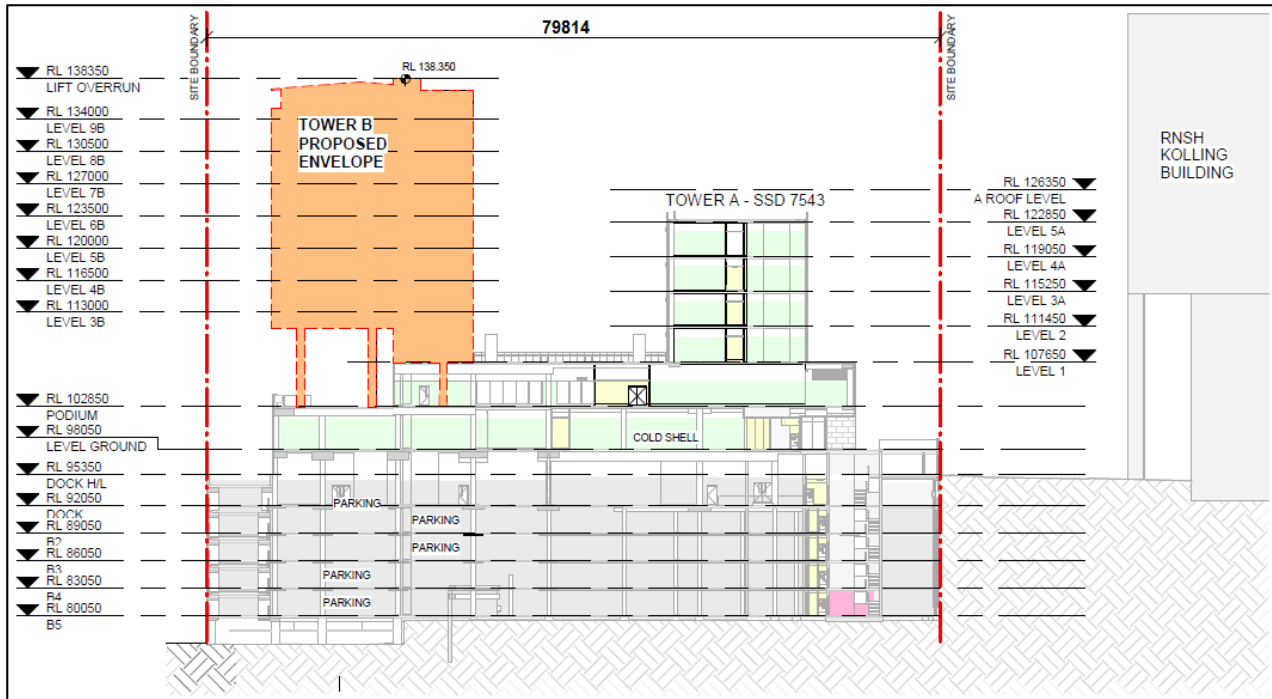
Tower B section (Source: Tower B concept RtS Addendum)
